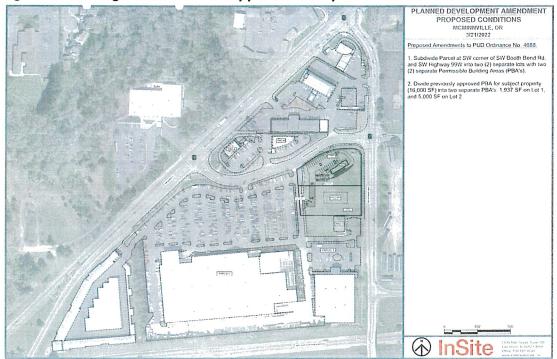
Enlargement of Subject Property and Applicant's Proposed Site Plan
